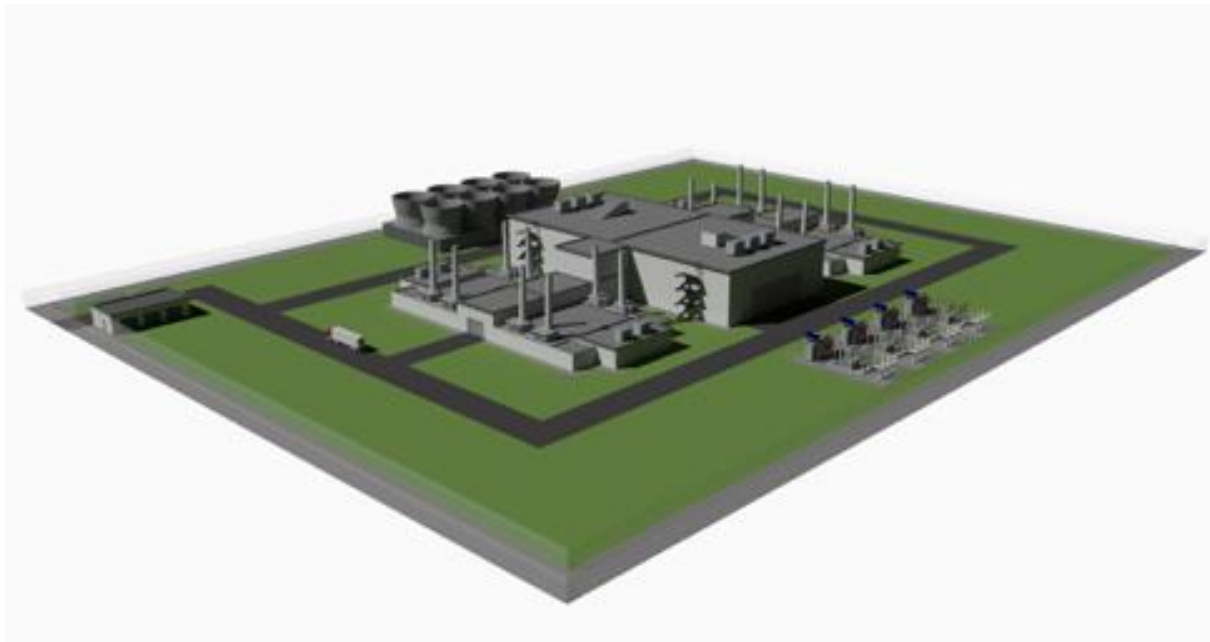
Conceptual layout of a 4x55 MWe SEALER-UK plant with its reactor units located underground.
